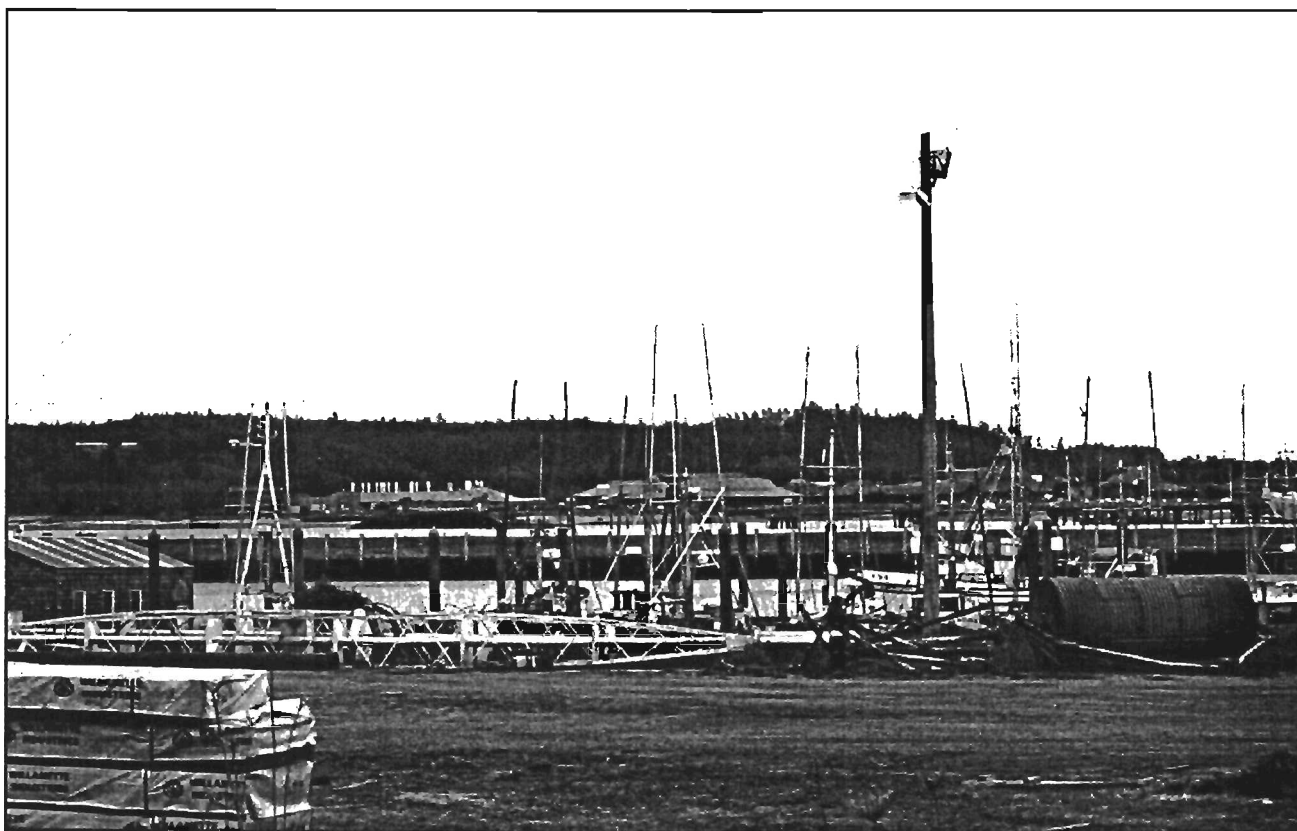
View of site from sidewalk along Yaquina Bay Road looking in SW direction.
